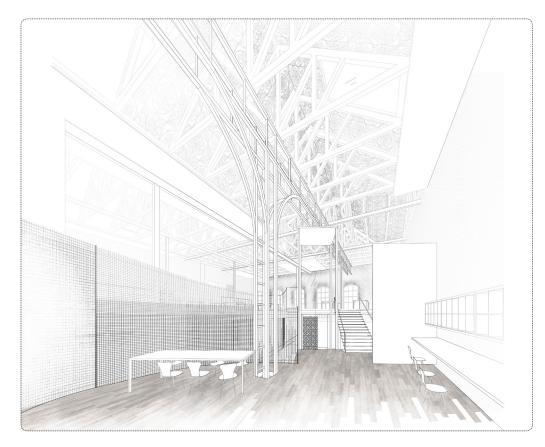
Spatial perspective of new mezzanine floor (Author 2013)
